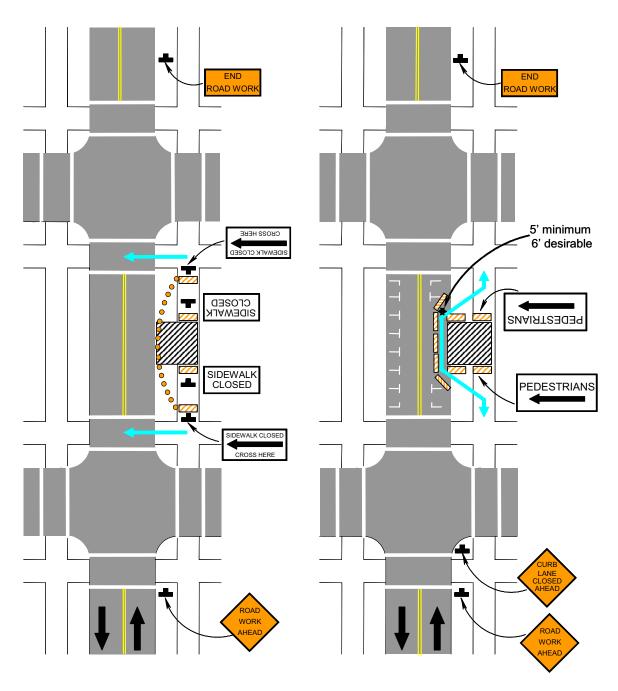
Sidewalk Closure and Bypass Sidewalk Operation
